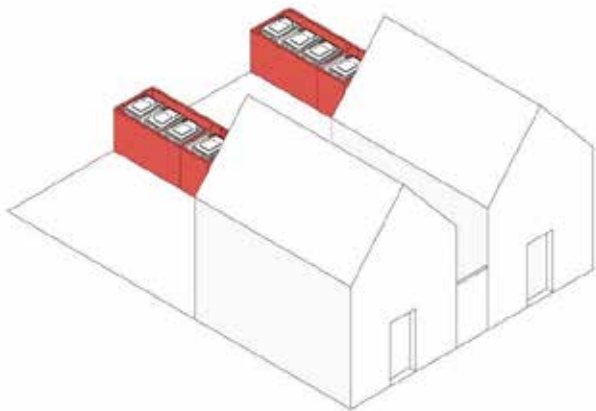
Bin collection area at Derwenthorpe, York. Collection areas to the sides of houses, away from people's windows and doors, are marked out with paving slabs and low fences
